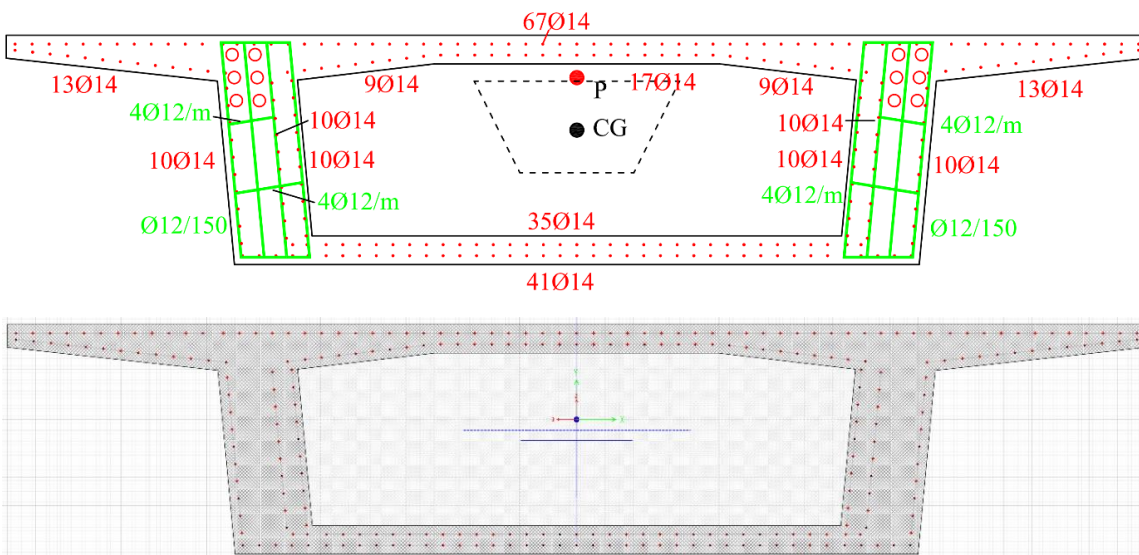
Detailing of Overpass T7 deck section  $A-A$  (top) and section modelling in SD (bottom)
